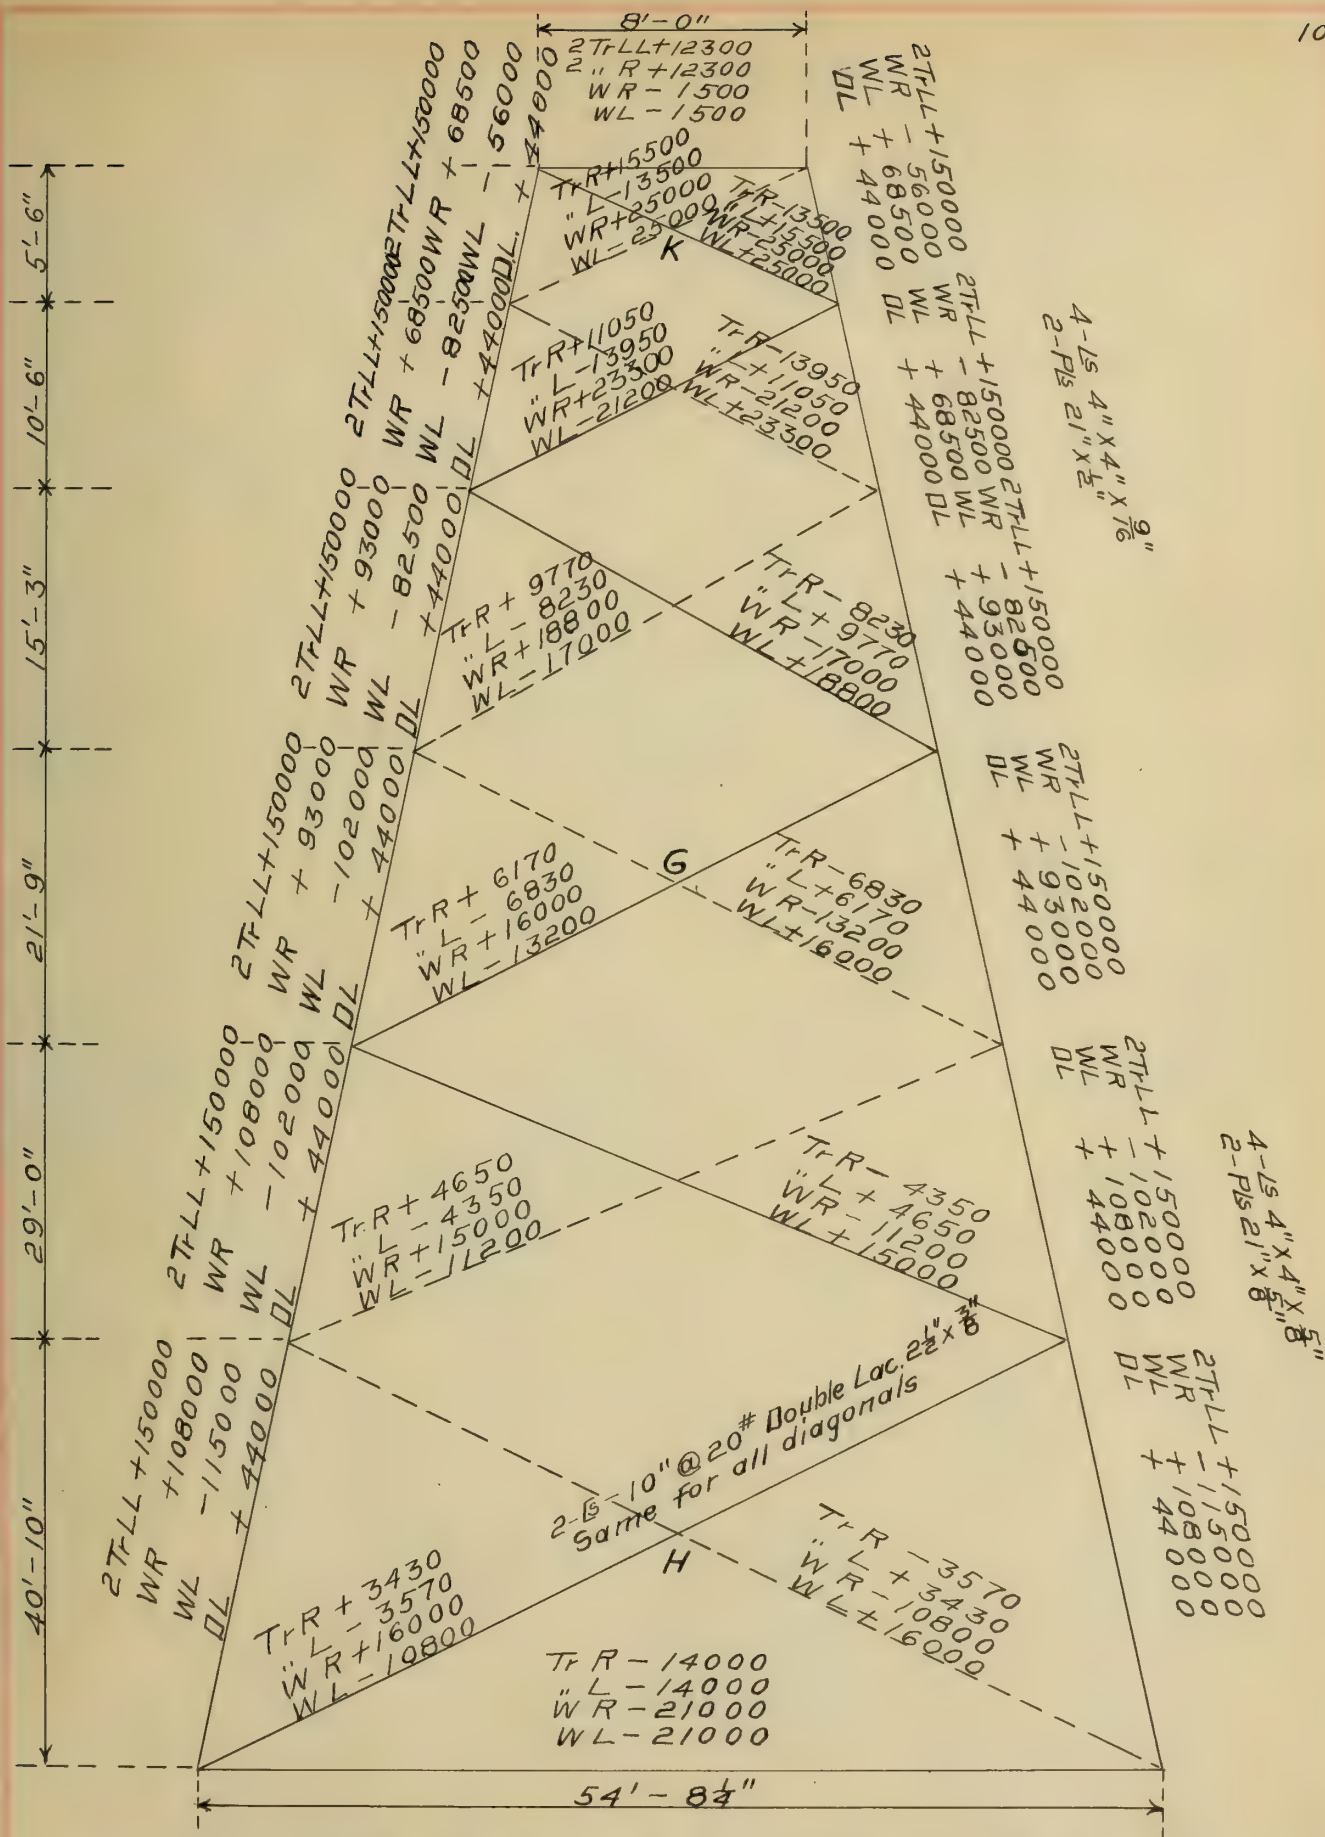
STRESS SHEET FOR TRANSVERSE BRACING.
